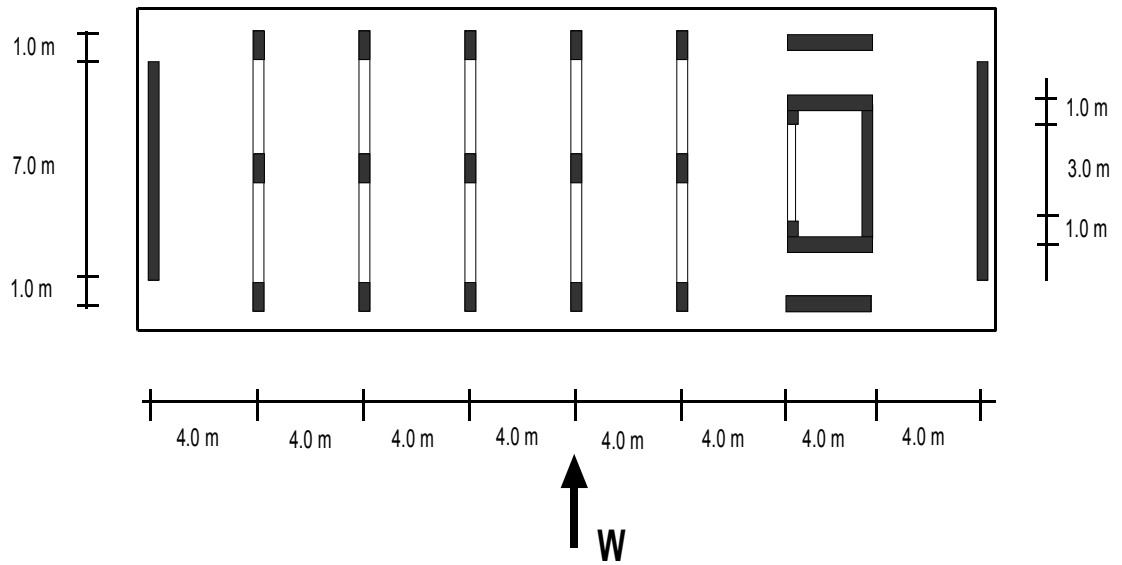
Plan View of the Shear Wall-Frame Structure
